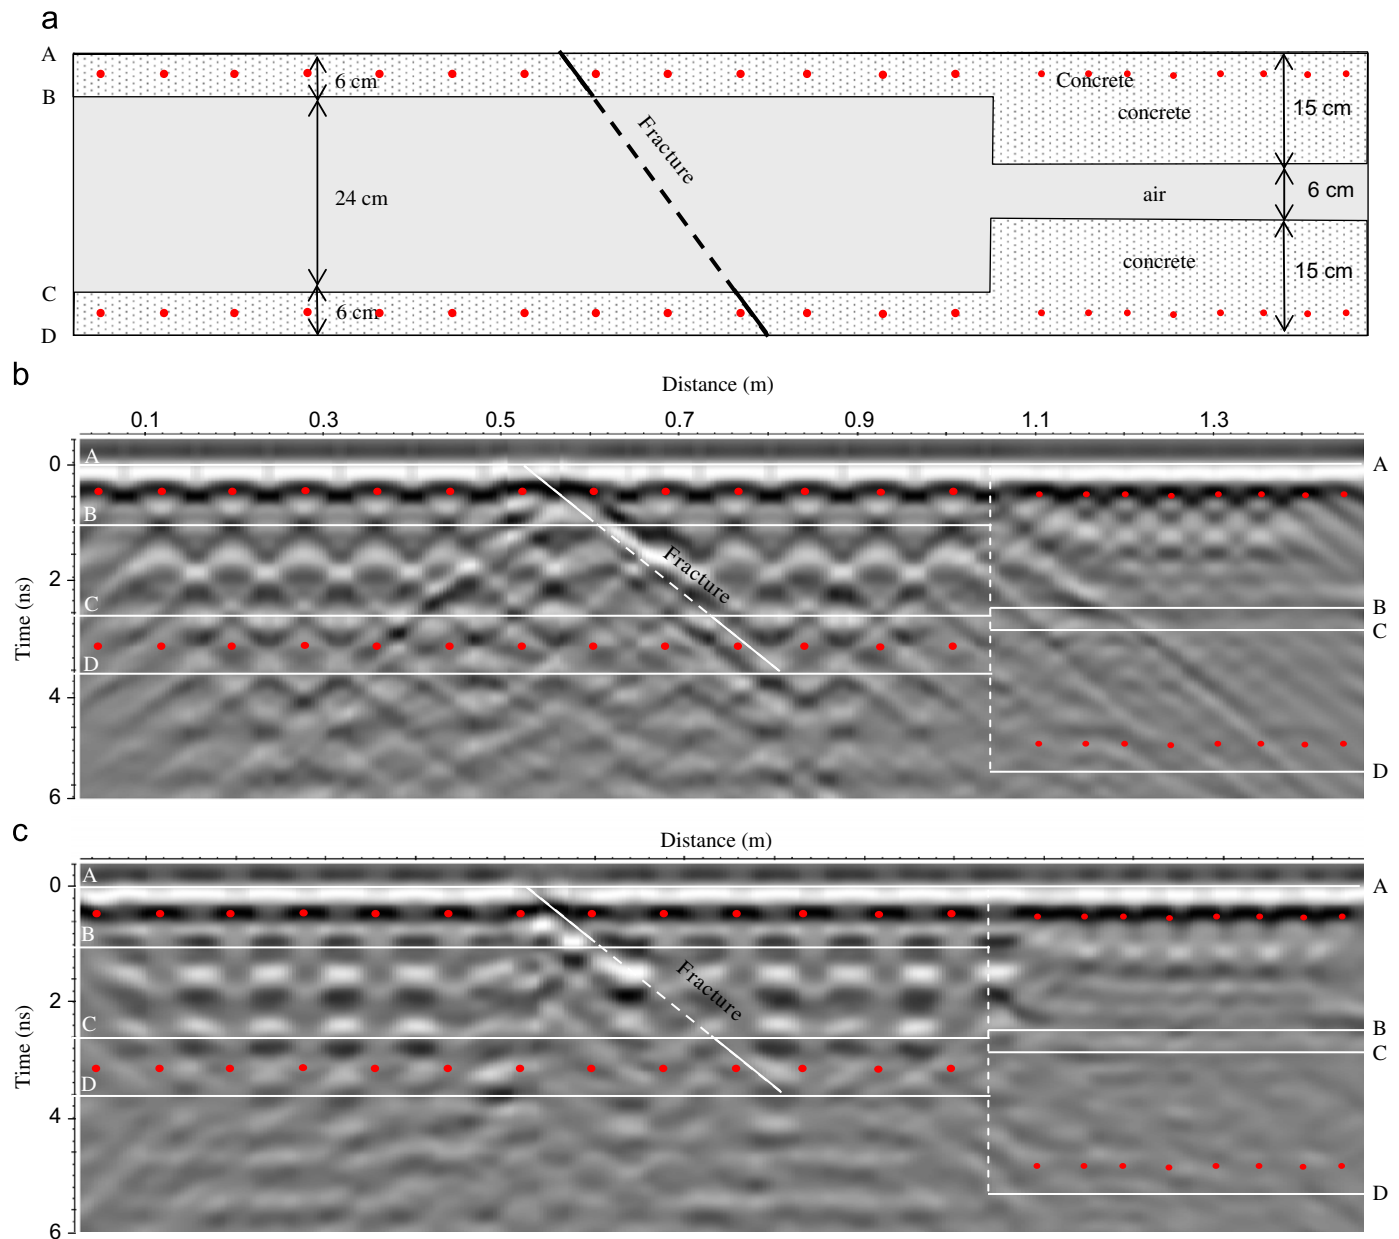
(a) Pier model with geometry the same as actual pier. (b) GPR section of model. (c) Migrated section of data in (b). (A and B) Top and bottom of first concrete layer. (C and D) Top and bottom of the second concrete layer.
